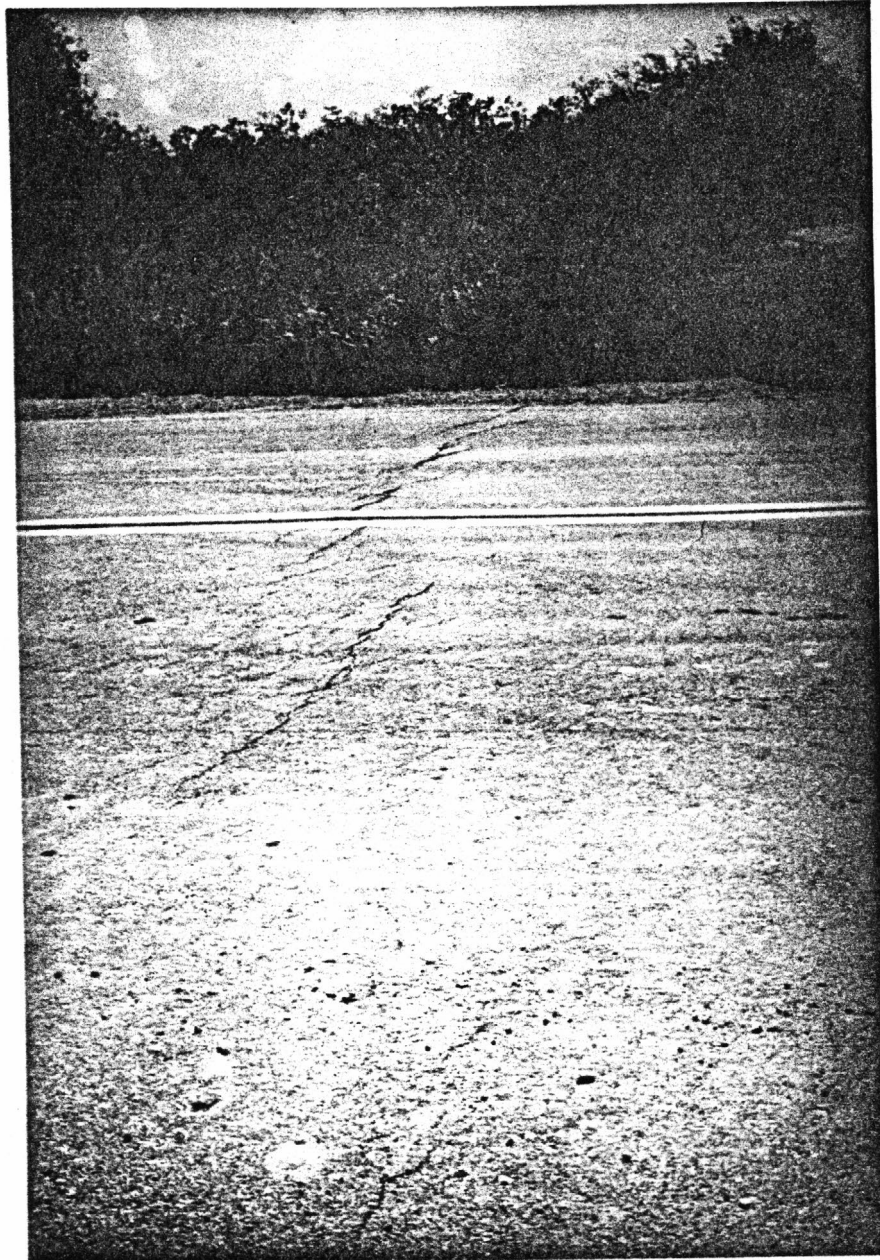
View southeast along Calaveras fault trace at Shore Road. SHR1 is in shoulder in left upper center of picture. Arrow indicates hairline crack extending from dirt shoulder into roadway.
